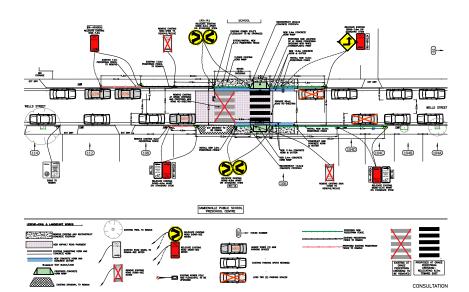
Wells Street between Edgeware Road and Commodore Street
